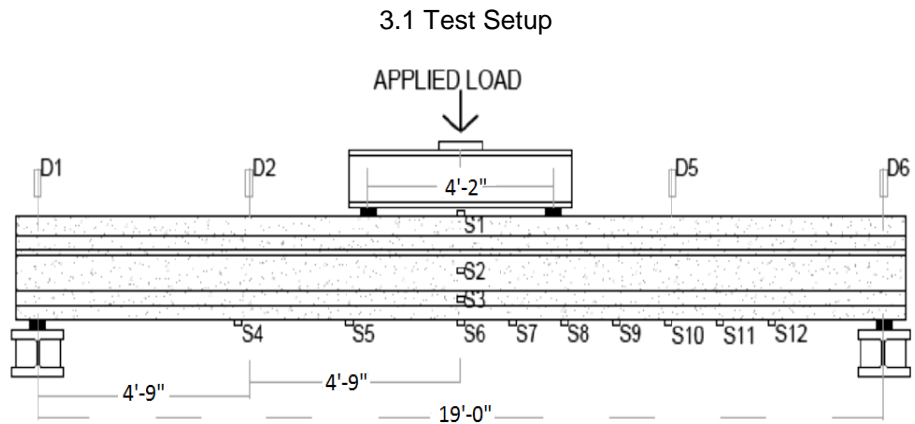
shows the test setup used in the experiment. The half-scale PS girders were statically tested by arranging the 20 ft long girders spanned across 19 ft and resting them on neoprene pads. A steel I-beam spreader bar was positioned at the mid-span of the beam and rested on two neoprene bearing pads with a center to center distance of 4 feet 2 inch. The load to the top surface of the spreader beam was measured using an actuator. LVDT deflection gauges were set-up at the middle of the span above and below the beam. LVDT deflection gauges (D_x) were also placed over both the supports and the quarter points in the beam. Twelve Strain gauges (S_x) were used along the cross-section height and the tension face of the beam.
